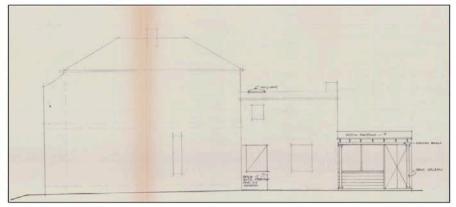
Proposed western elevation. J. Greenwood (1984). Inner West Council Archives
